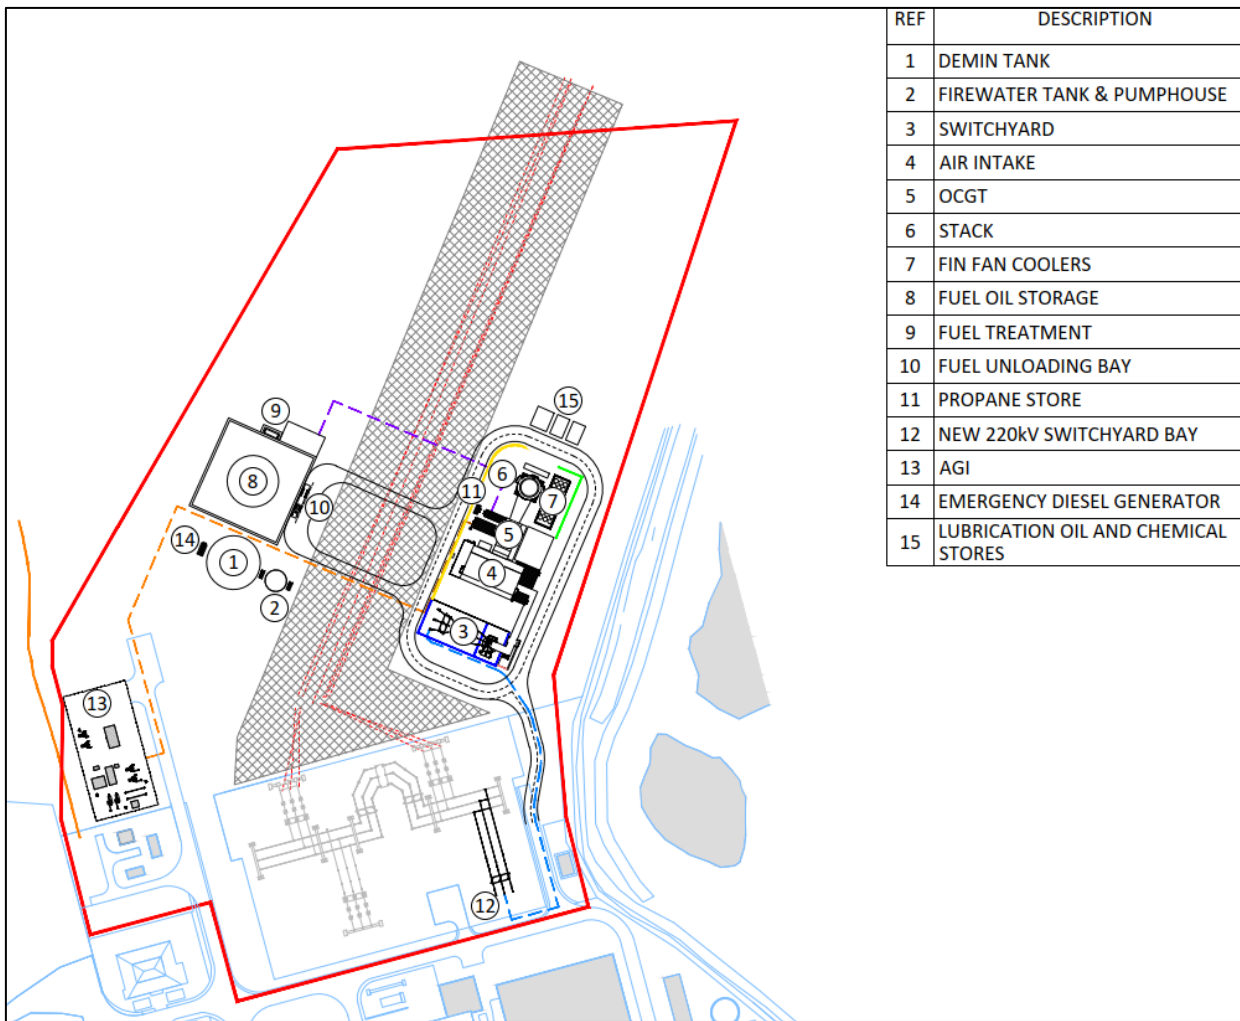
Site Plan - Layout Option – Tynagh North Option B
